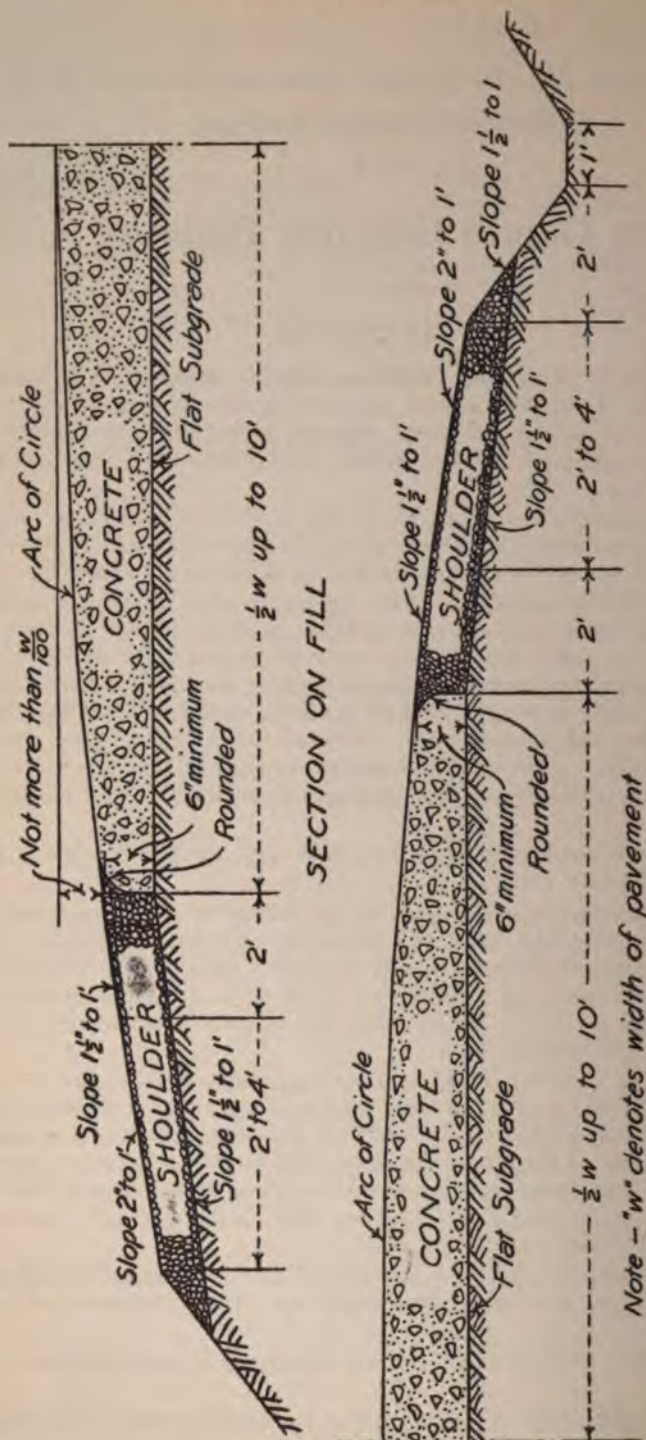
ONE COURSE CONCRETE HIGHWAY
